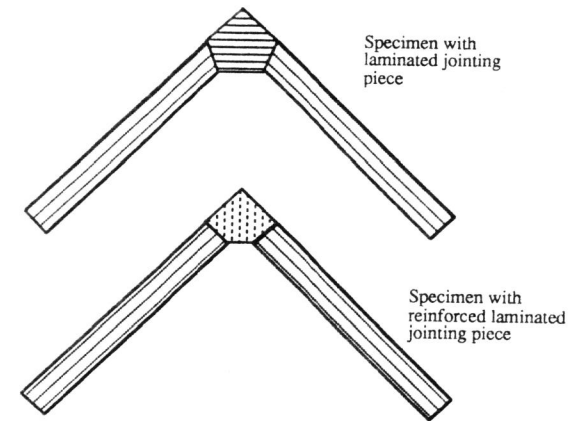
Design of angle specimens, jointing piece reinforced or non-reinforced.
